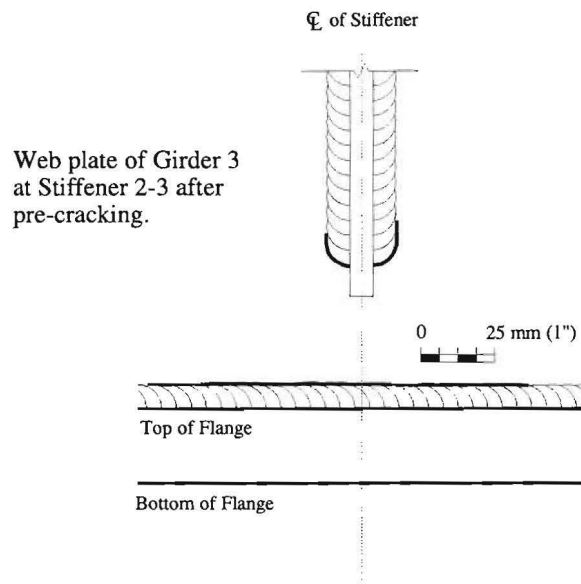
Pre-cracking in web plate of Girder 2 at weld toe of Stiffener 3.
